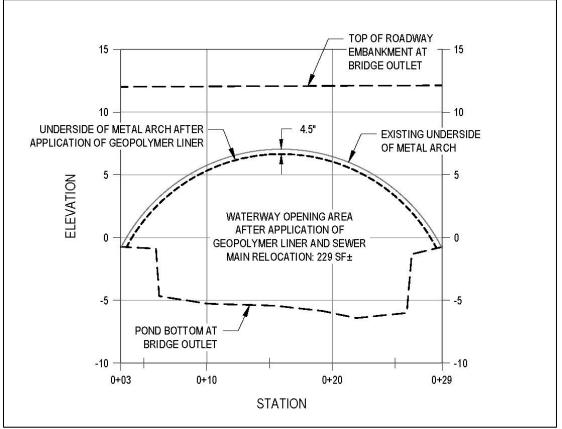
Bridge Rehabilitation Alternative 3 outlet cross-section
